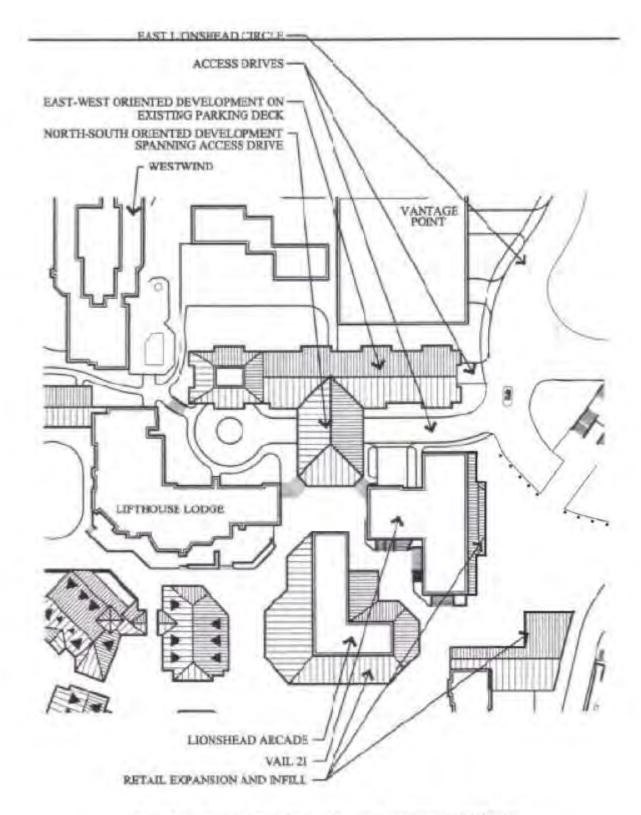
Abernative Redevelopment Opportunity at Lionapride Building Site
